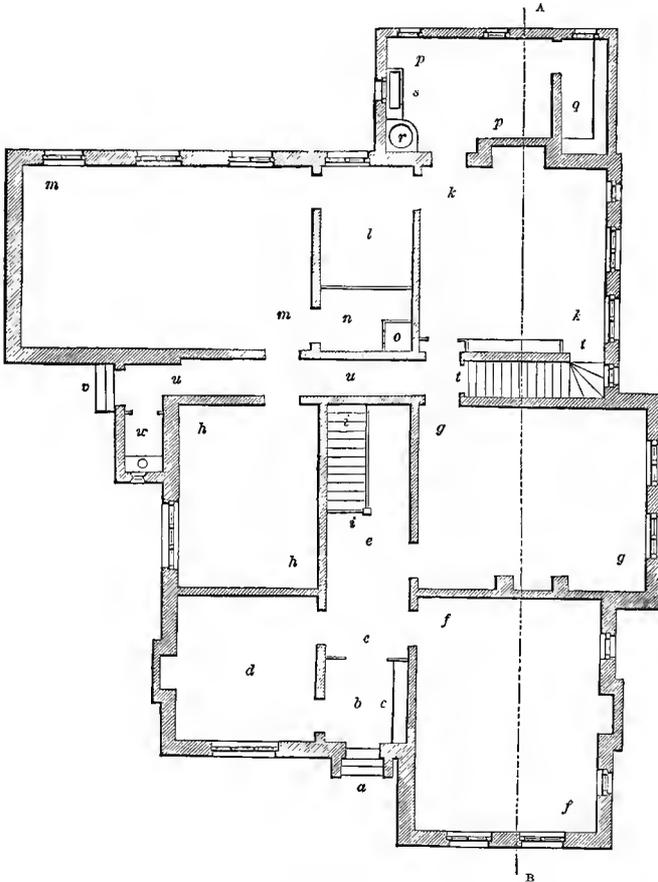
Ground-plan of farmhouse—scale in Plate VIII.
